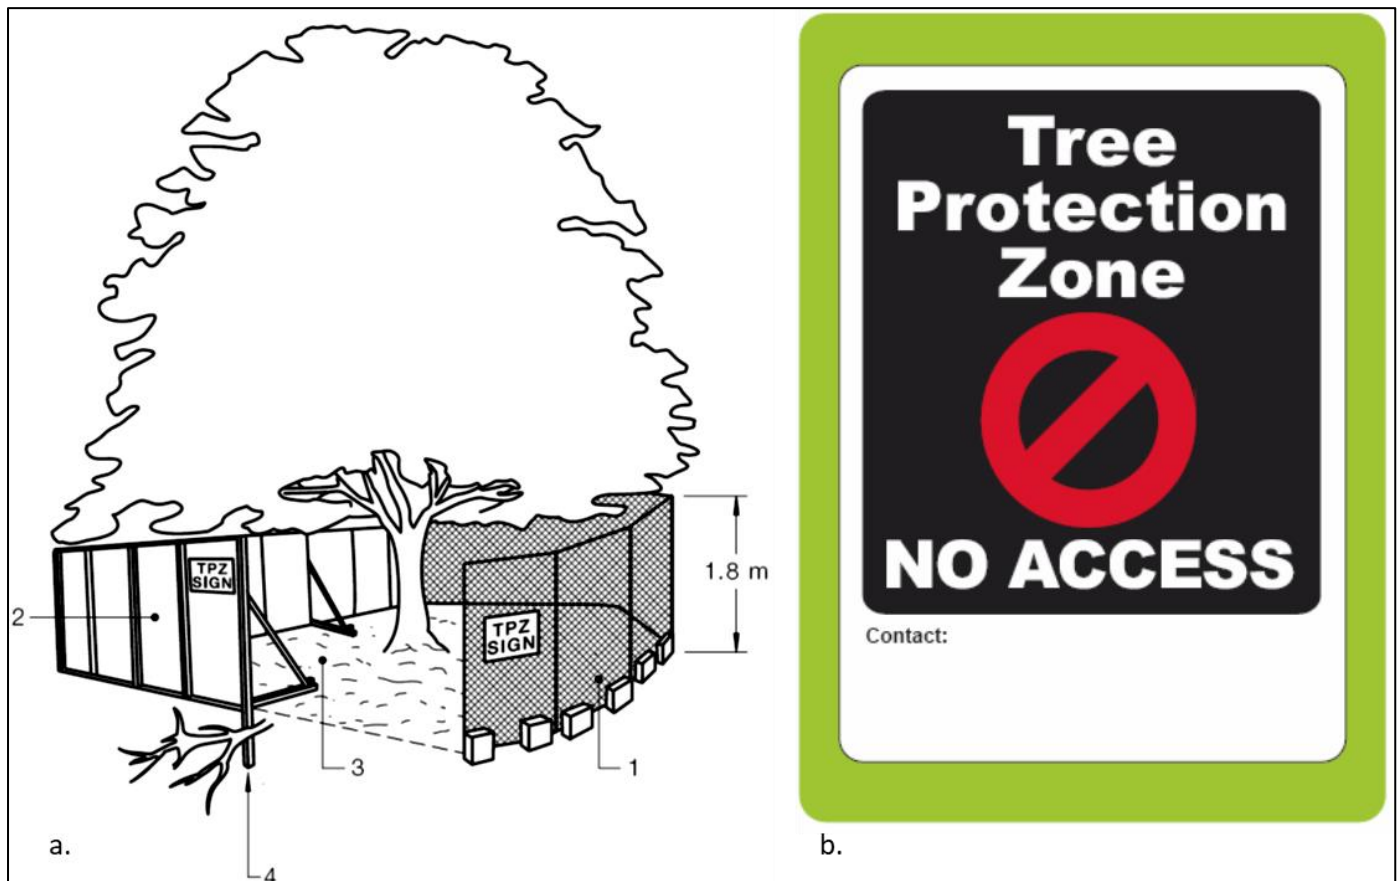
Protection fencing should be erected around the specified perimeter of TPZs in accordance with Section 4.3 of *AS4970 (2009)*. Figure 21 a. depicts correctly installed steel or plywood fence panelling (1 and 2) with mulch inside the protection area (3). Figure 21 b. shows depicts protection fencing signage.
